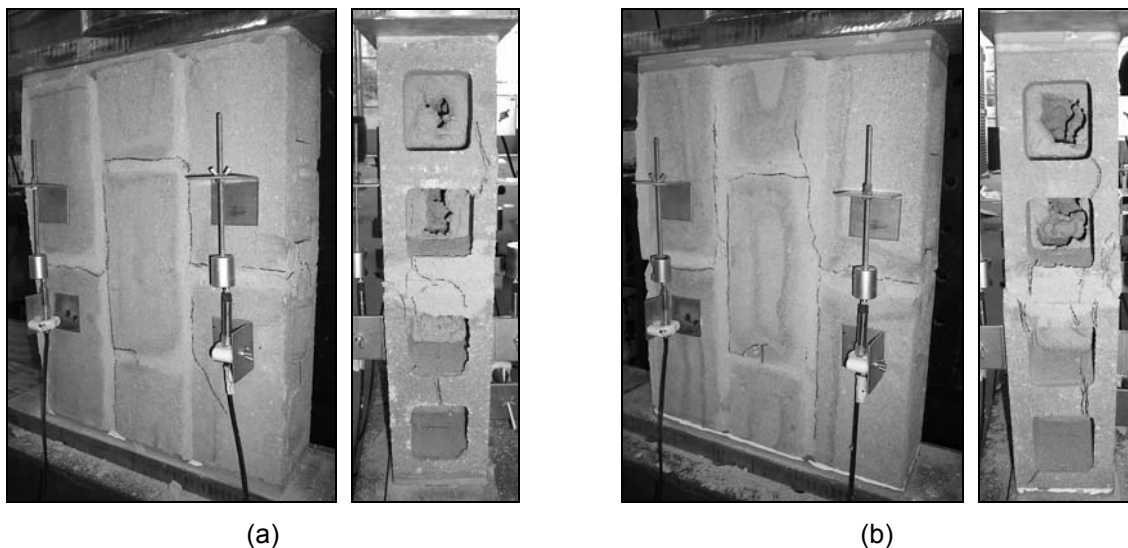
Cracking patterns of specimens built with 2C-units: (a) specimen 2 and (b) specimen 3.
